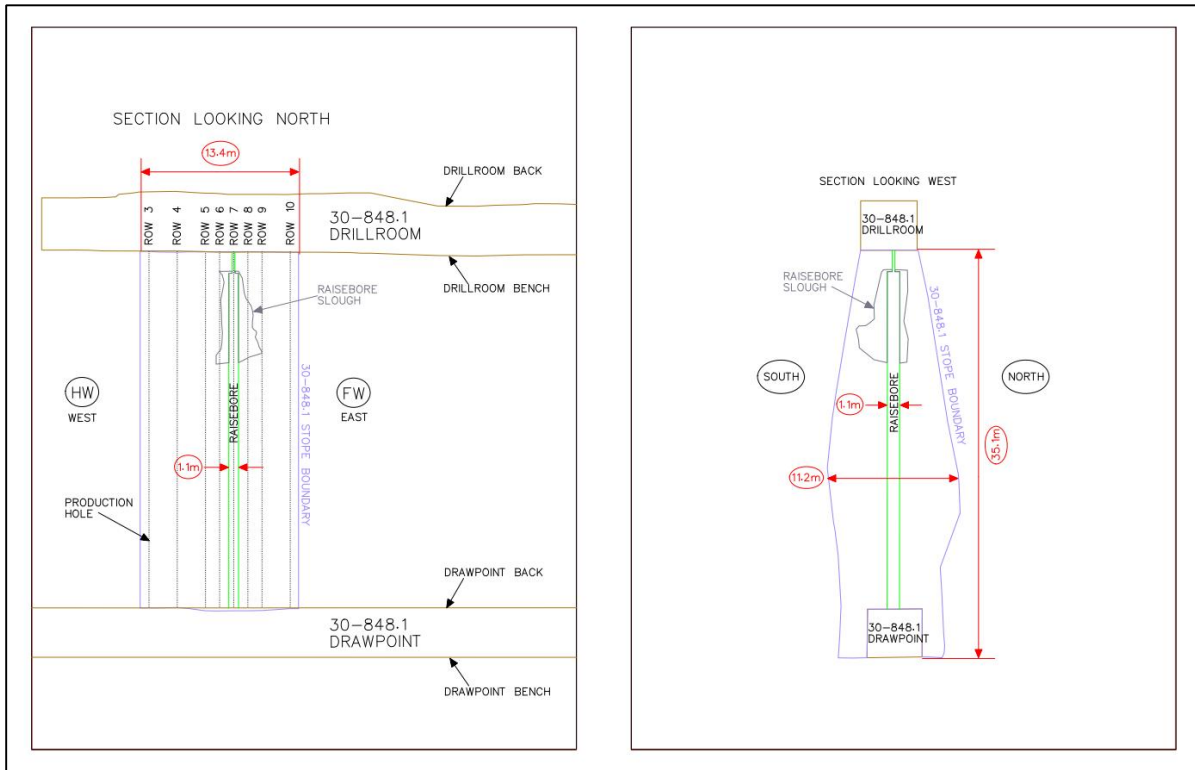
Longsection and cross-section for the 30-848.1 stope
